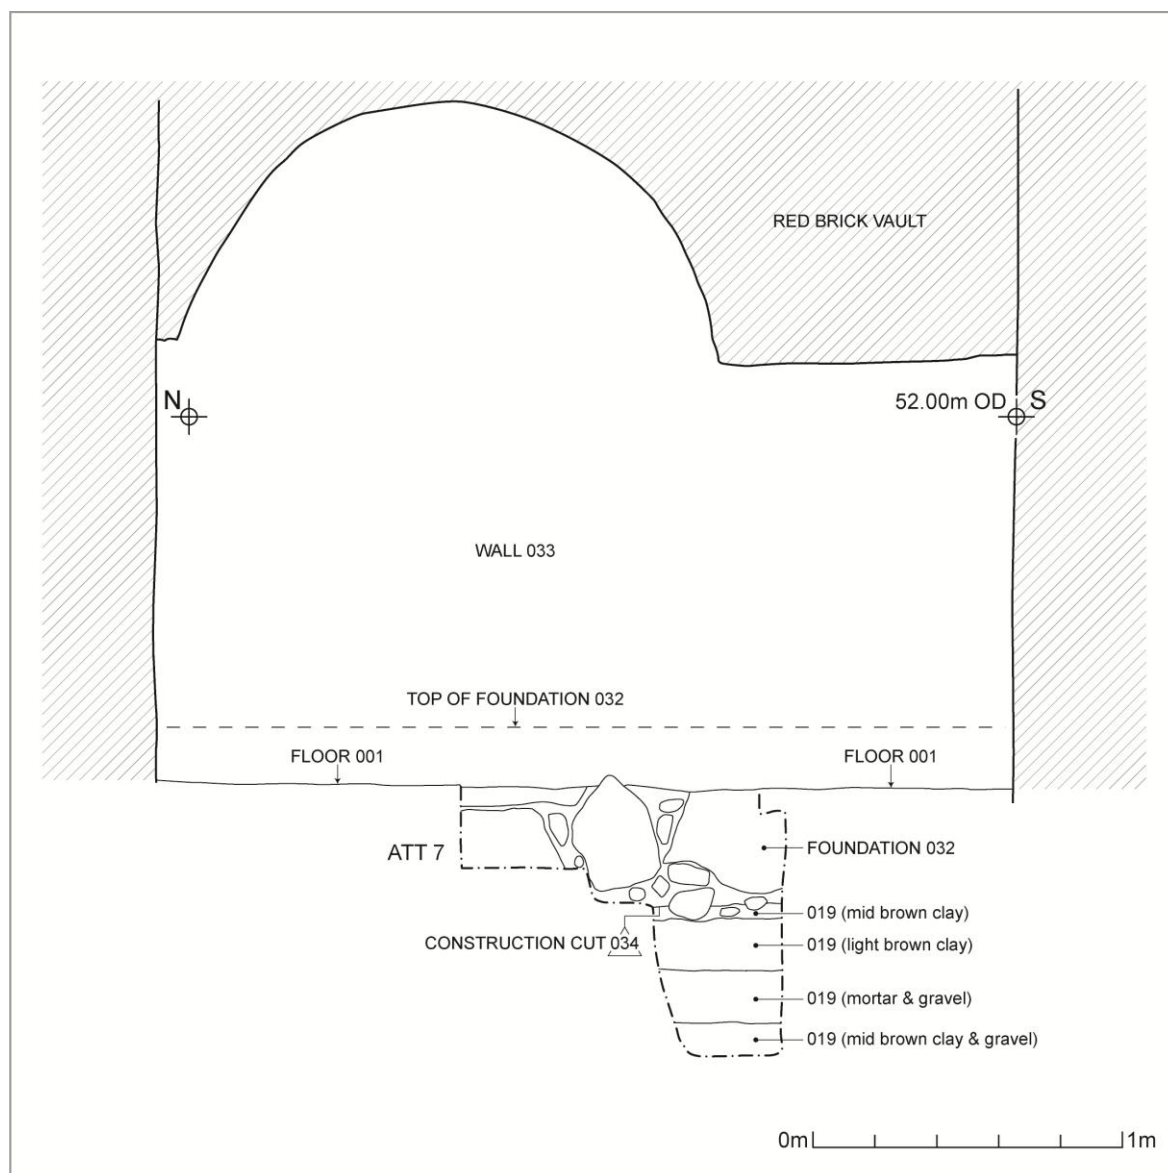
ATT7, west facing elevation, showing the borrow pit underlying the wall foundation 032
